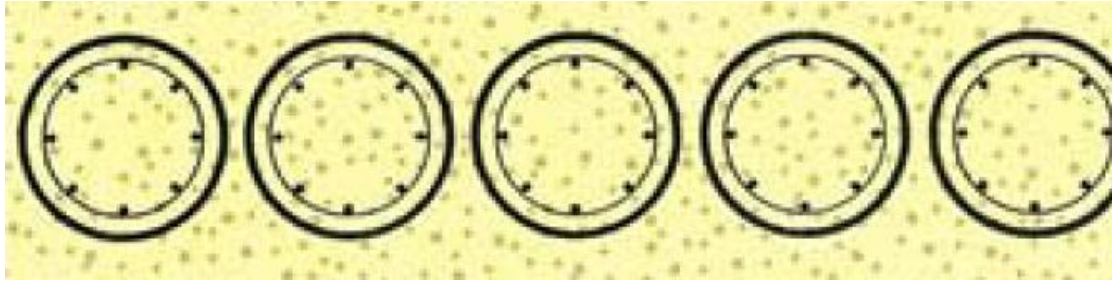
Continuous pile wall, CFA-pile wall (Franki piling, 2008)
